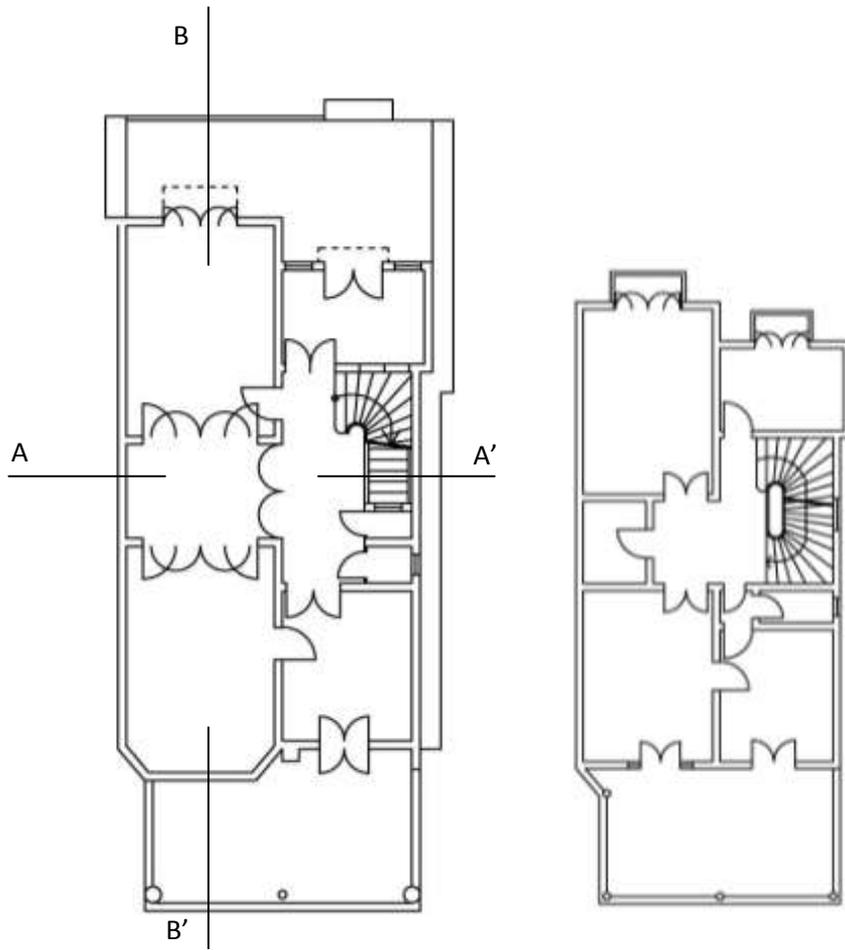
Entrance and first floor plans of the house at 124 lot 3 parcel
